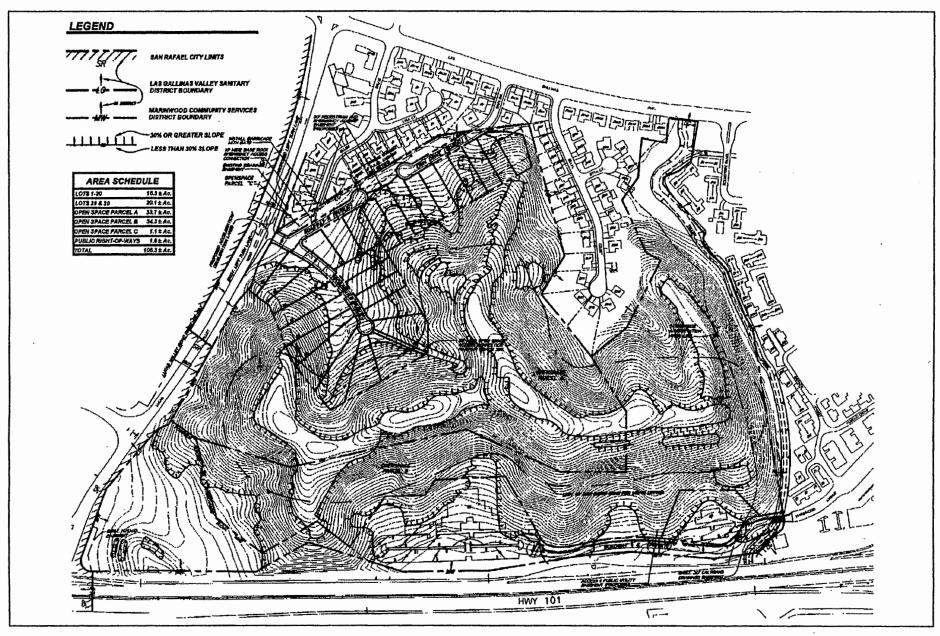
PROPOSED DEVELOPMENT PLAN Oakview Master Plan
